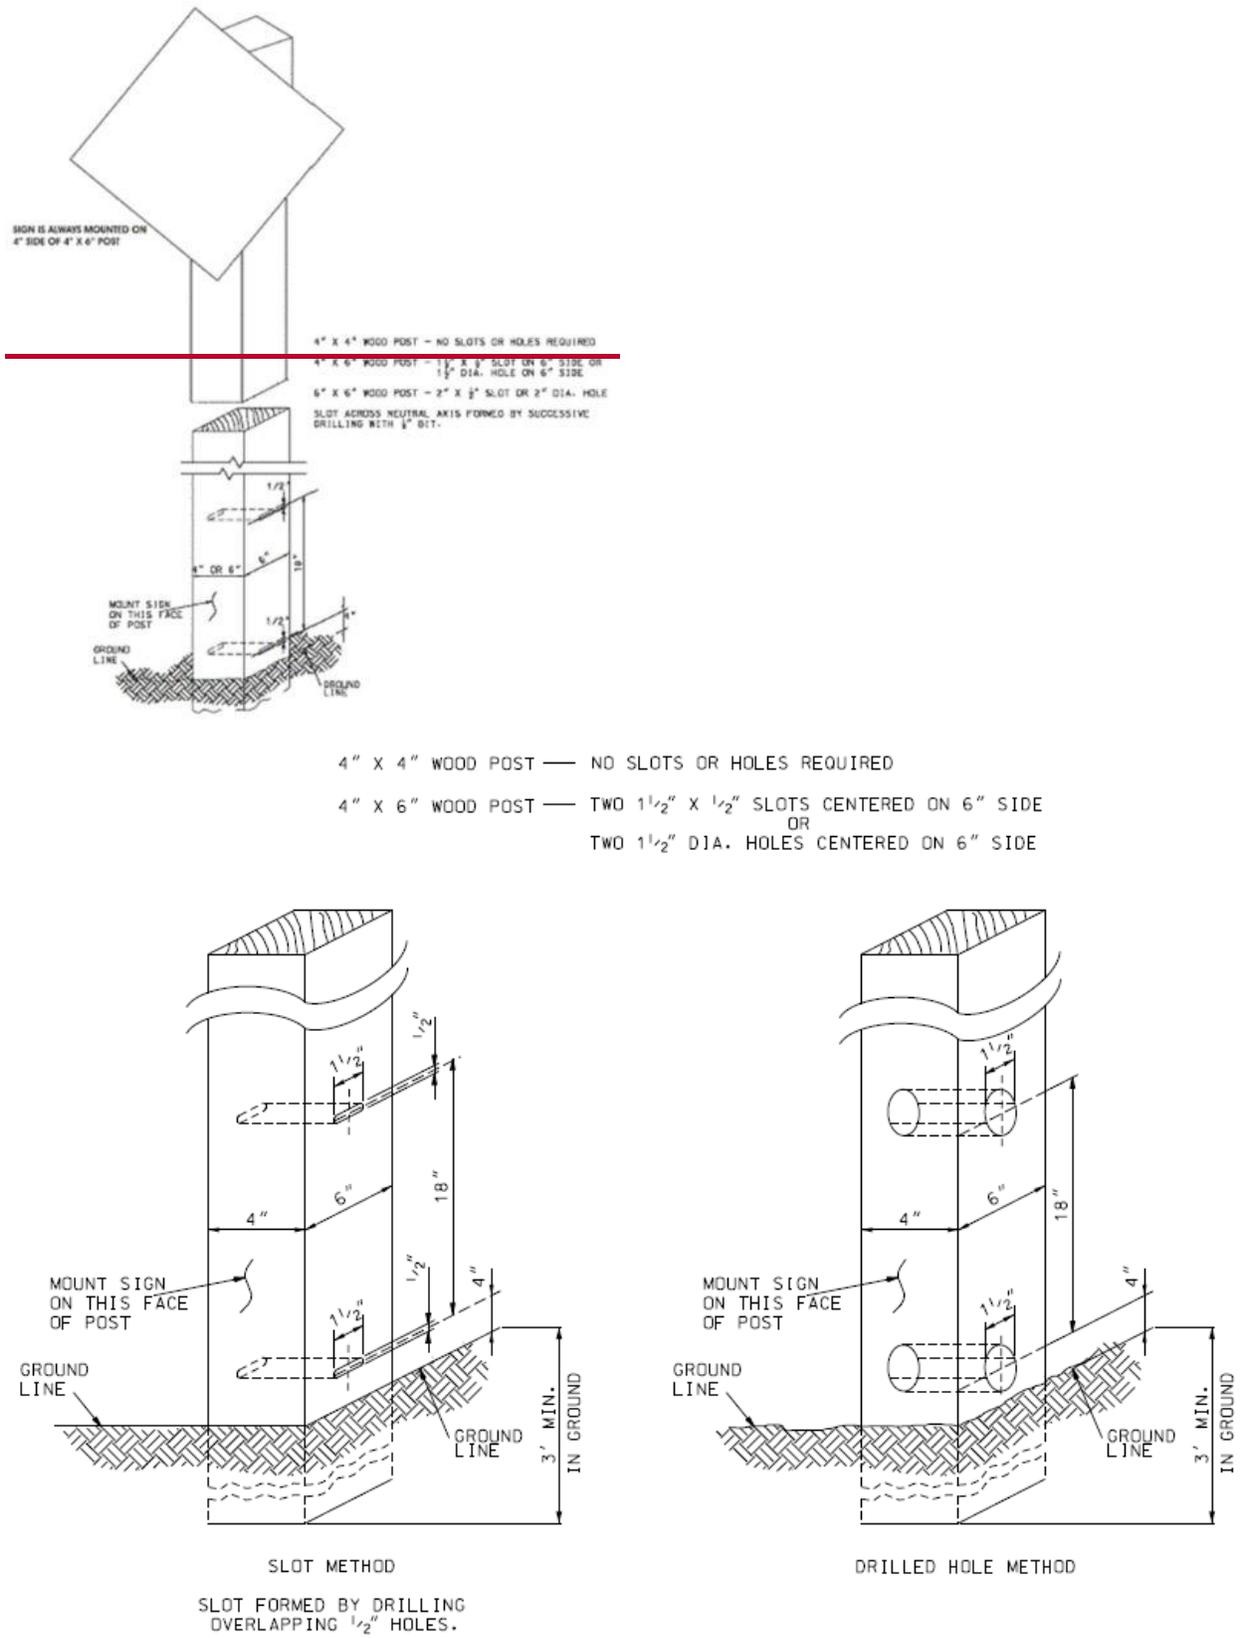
Details for Wood Posts Requiring Breakaway Design
